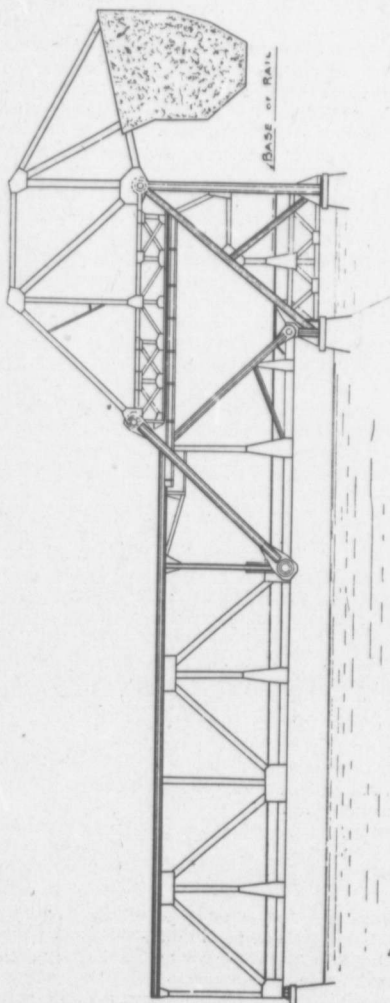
Side elevation of Trunnion Bascule Bridge over the Kaministiquia River.
